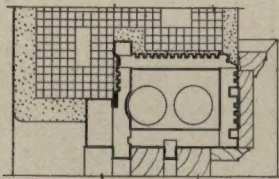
Showing 8-inch tile with special jamb block and plaster on tile. Anchor strip in position to give regular 5 1/4-inch jamb width.
